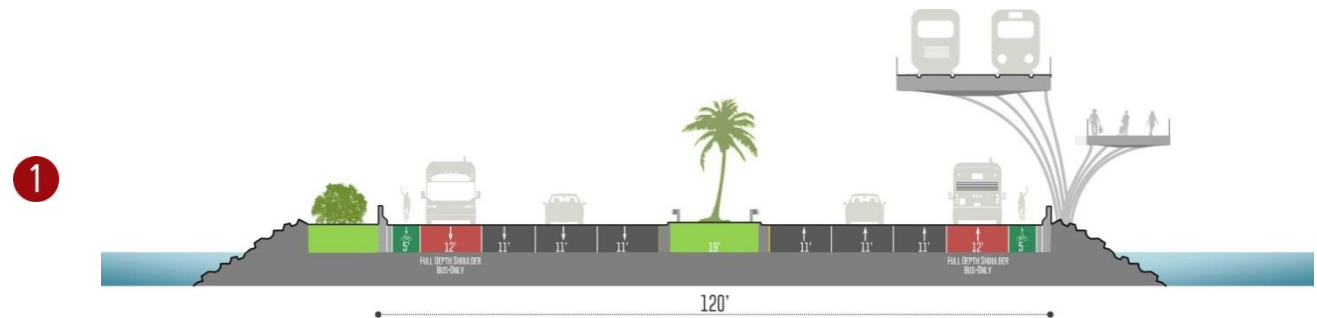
SR A1A/ MacArthur Causeway Transit Corridor Potential Typical Section from US-1 / Biscayne Blvd to SR 907/Alton Road
